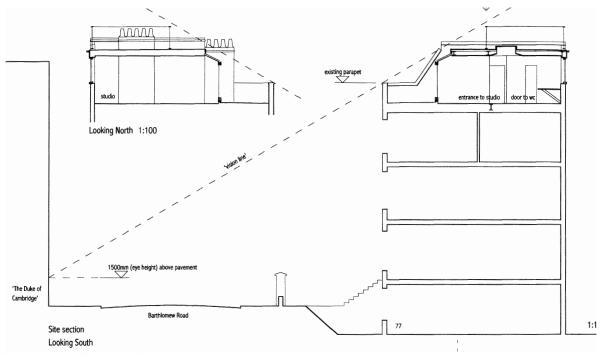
Approved Section of 77 Bartholomew Road Application PEX0100519
